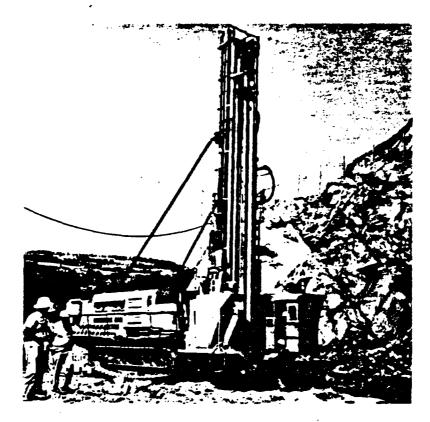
Track-mounted rotary drill (9-in. bit)
